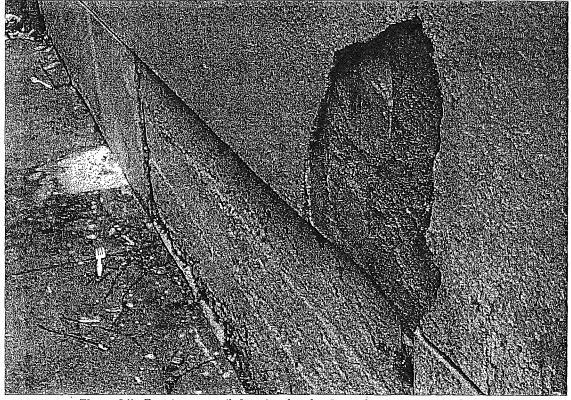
East tower, north façade, showing loss of stucco at ground level.
